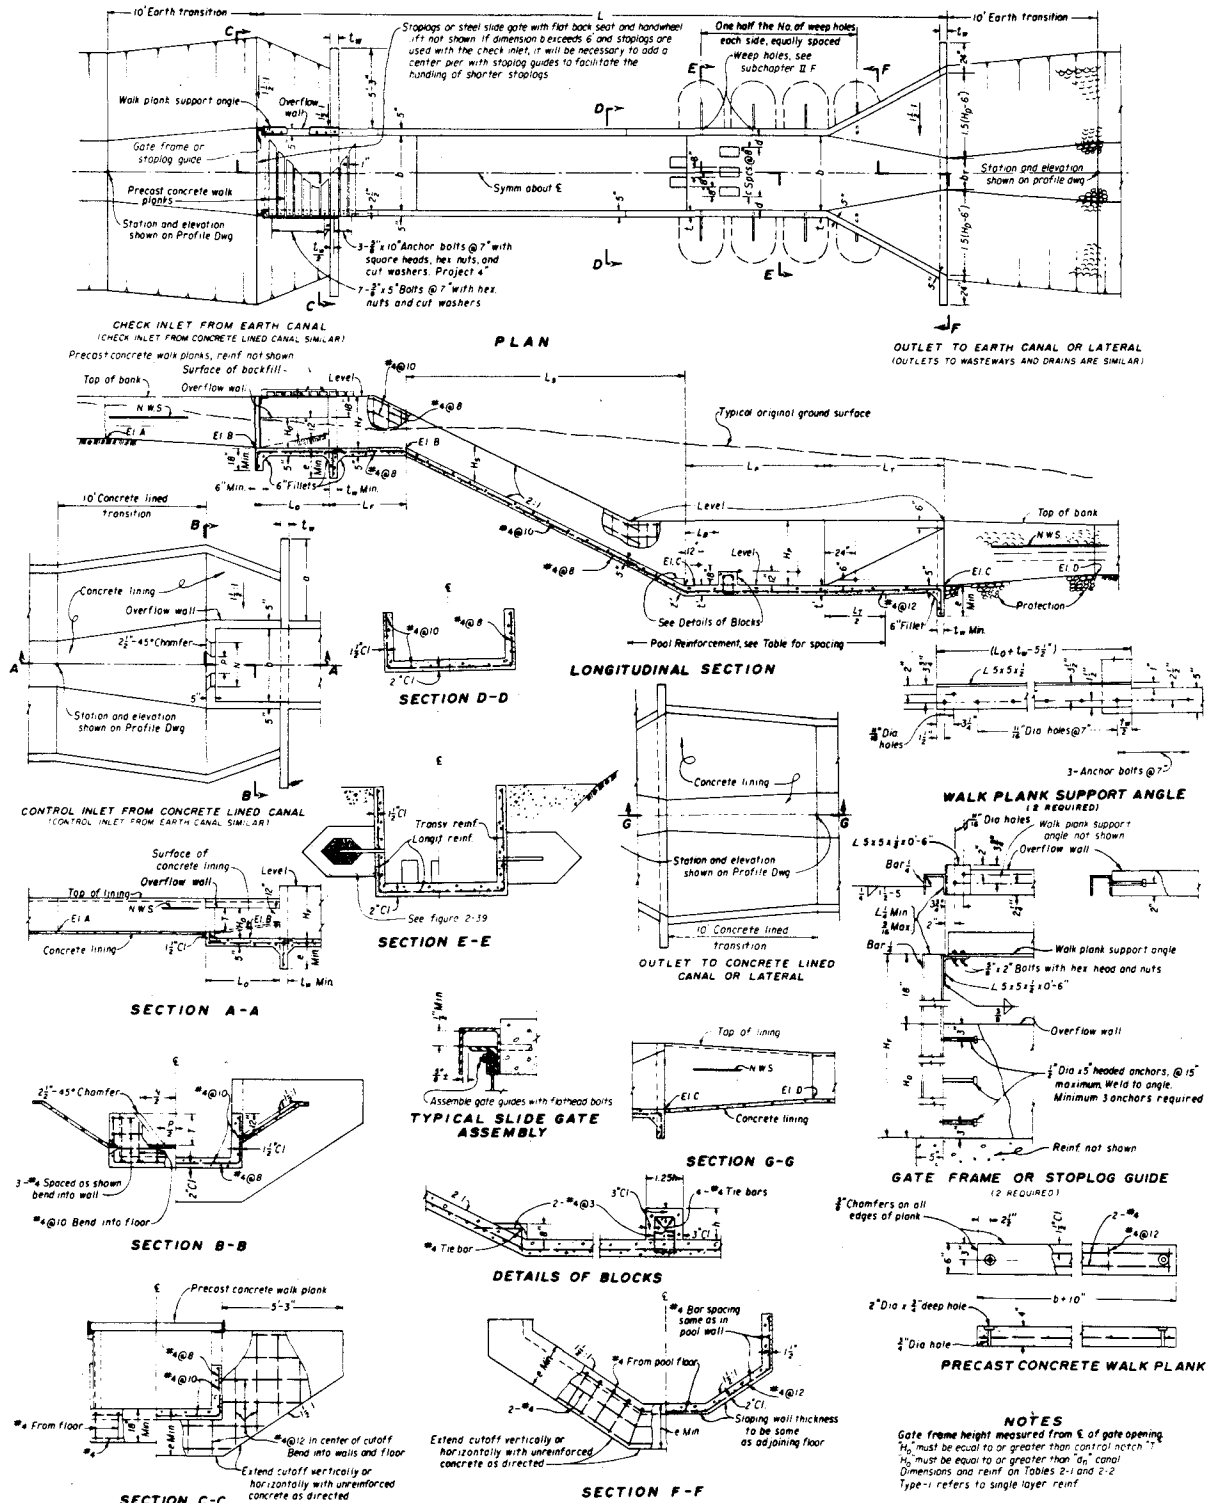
Rectangular inclined drop—type 1. 103-D-1262
